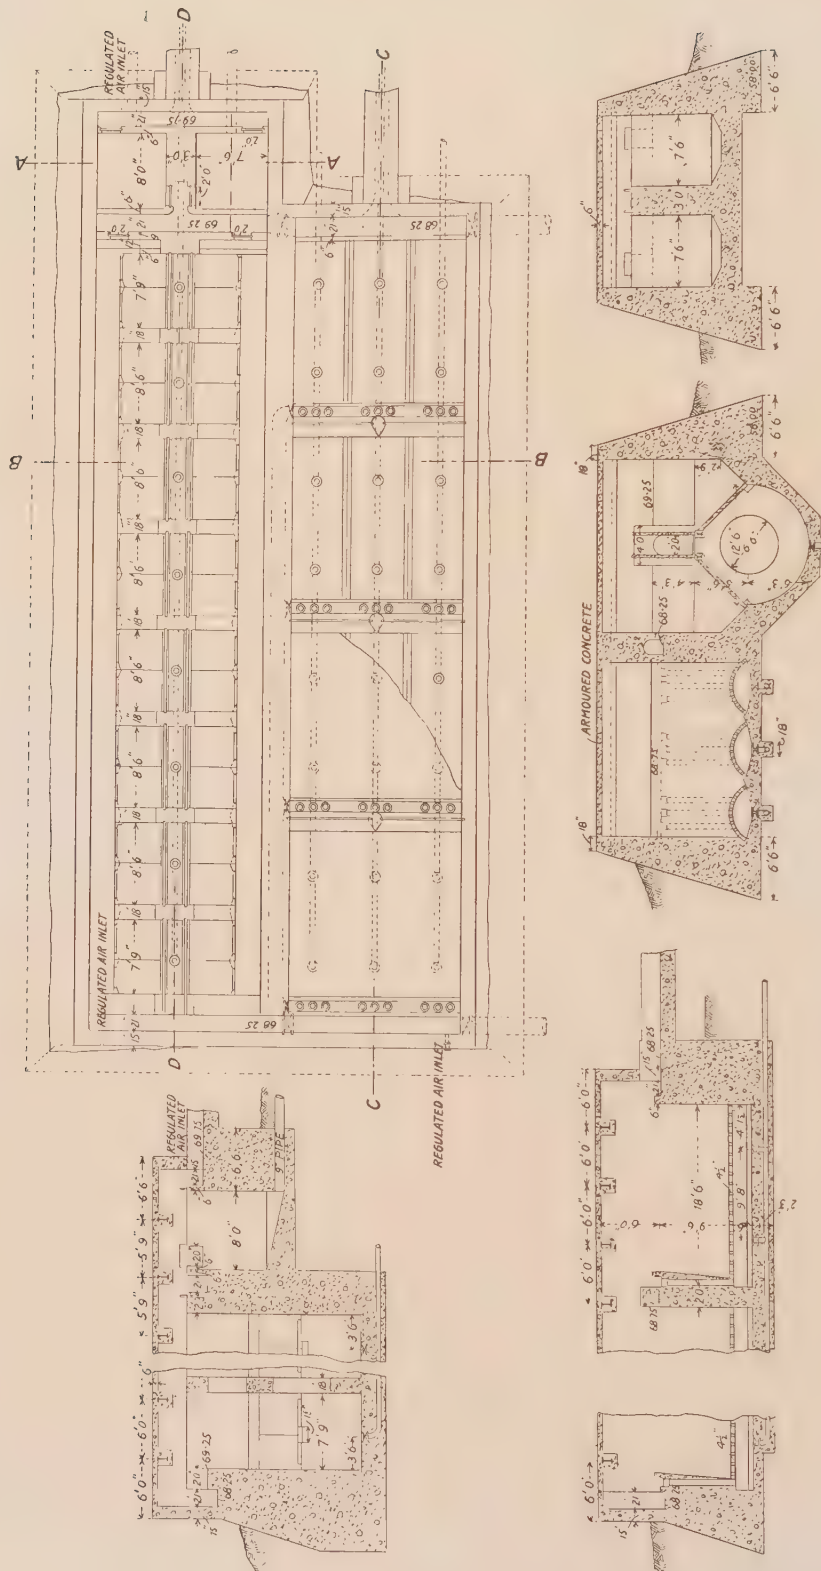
Hydrolytic Tank, Plan and Sections of Details.
